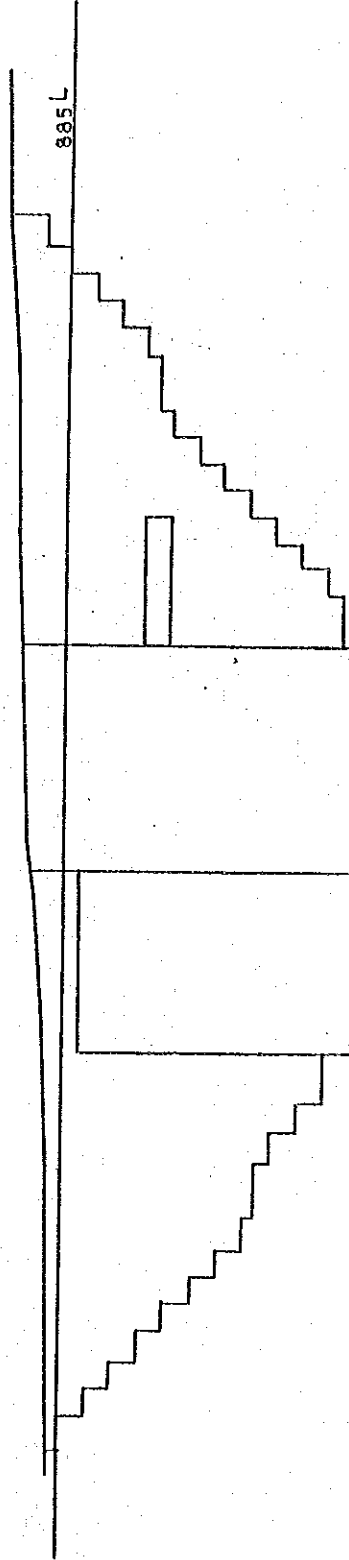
Final Pit Design for No. 2 Orebody (2)
